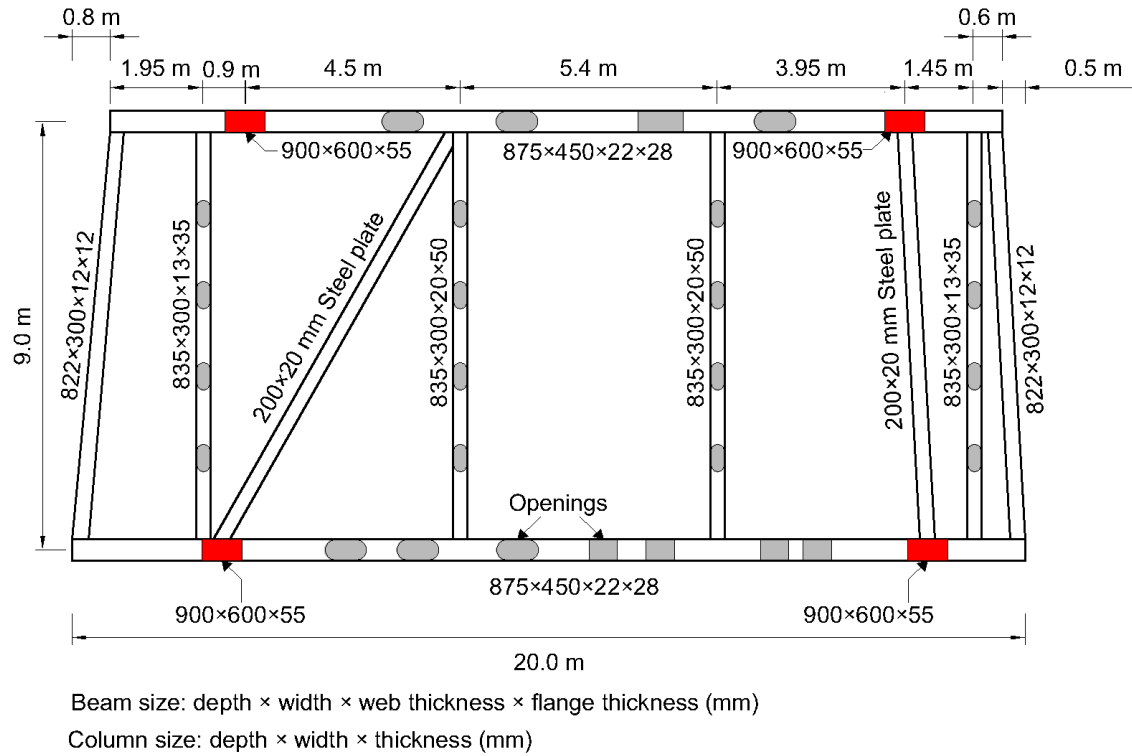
Key structural elements of Floor B. Red rectangles represent columns locations. The sections of the steel members are not standard, and their dimensions are shown in the figure.
